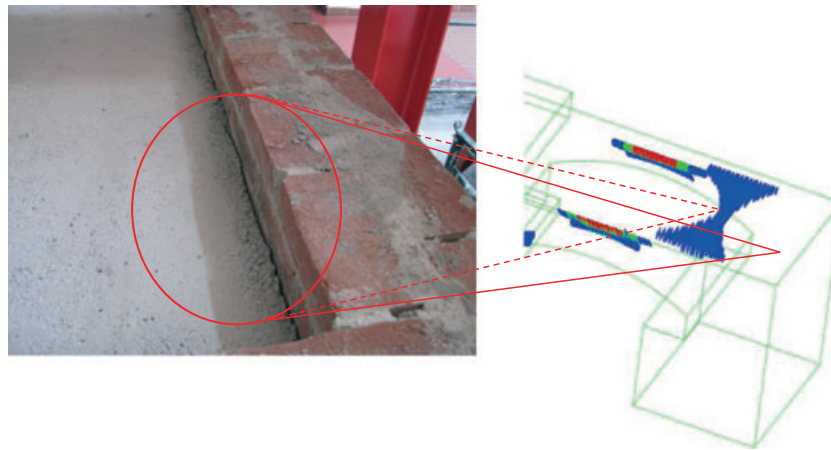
Detail of the detachment between the concrete slab and the masonry wall at the end of the bridge compared with the numerical previsions
